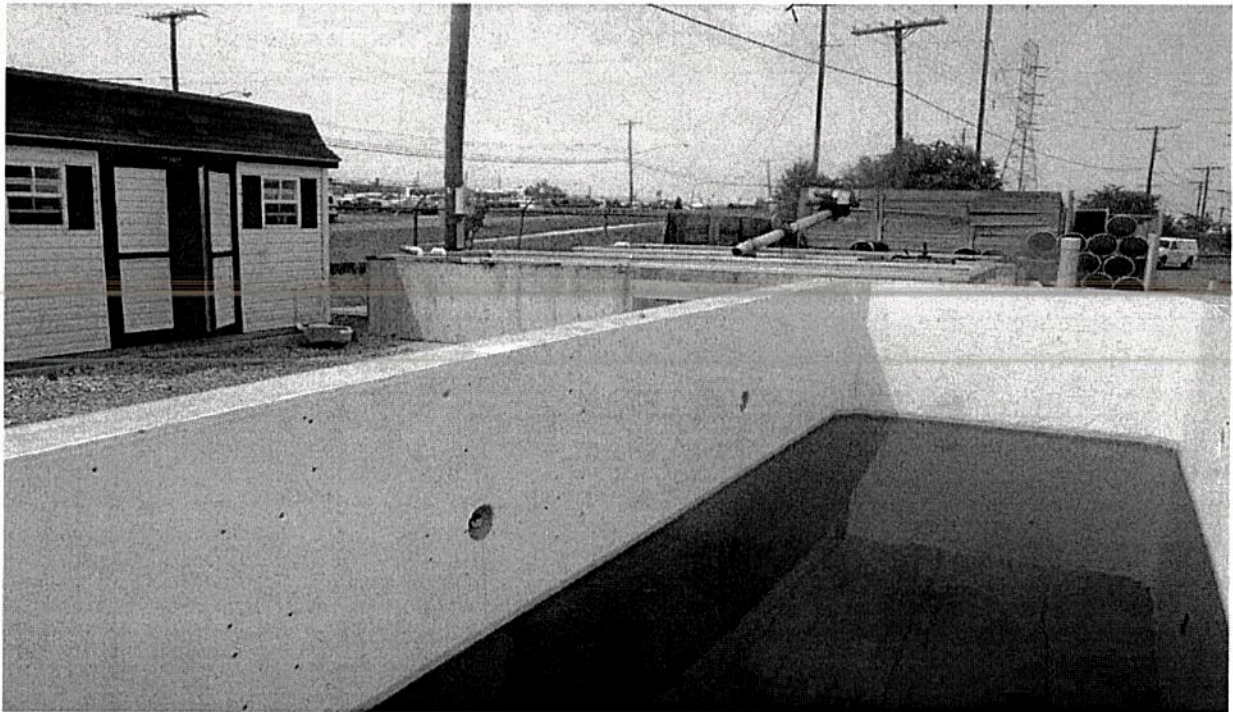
New additional storage tank at the oil/water separator at Outfall 003.
